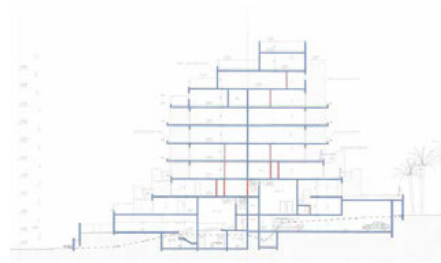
Aboveground parking areas in the section of a constructed building. 2008. (Drom HaSharon Committee)
